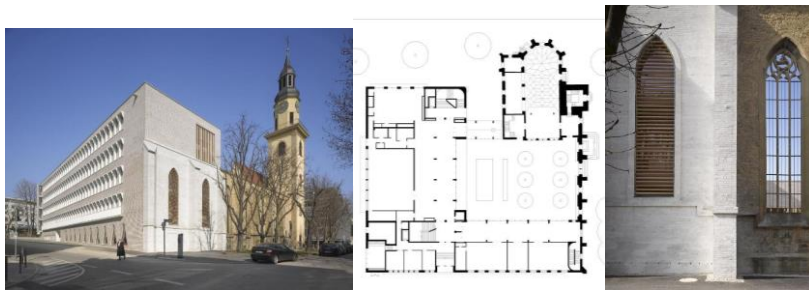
Evangelist Educational Centre Hospitalhof in Stuttgart (Main façade (URL-12); Main Floor Plan (URL-13); Façade detail: old & new (URL-13))
